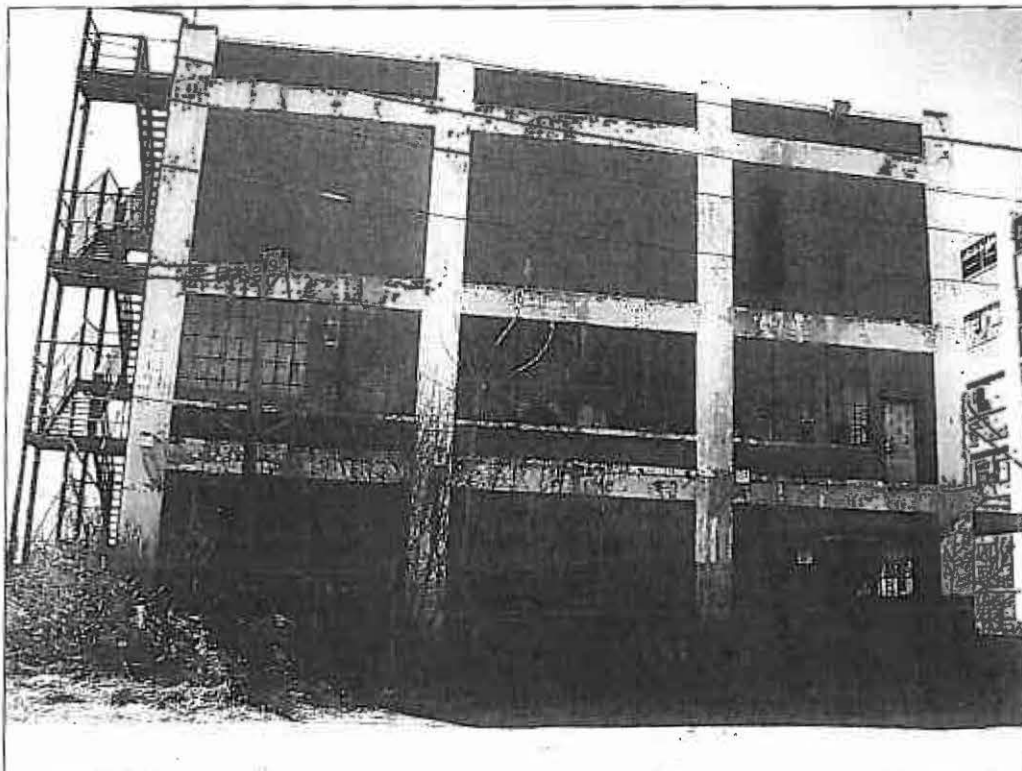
Exterior of north side of Building No. 7 and loading/unloading area (AOC F-1) at northwest corner of building.
